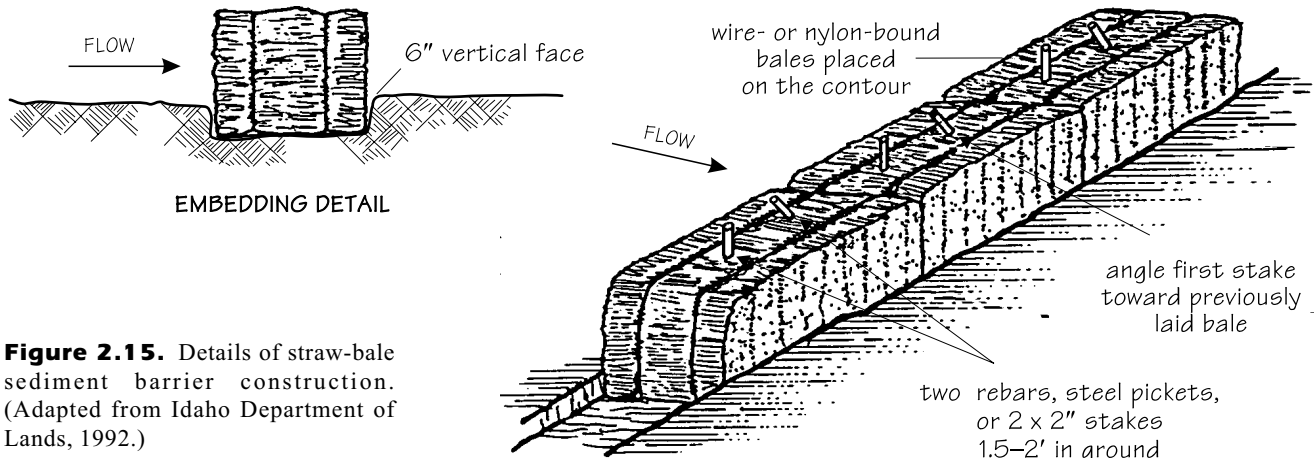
Details of straw-bale sediment barrier construction. (Adapted from Idaho Department of Lands, 1992.)
